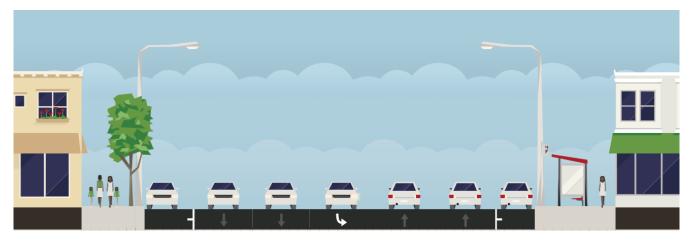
82 Avenue Facing East (East of 109 Street)
